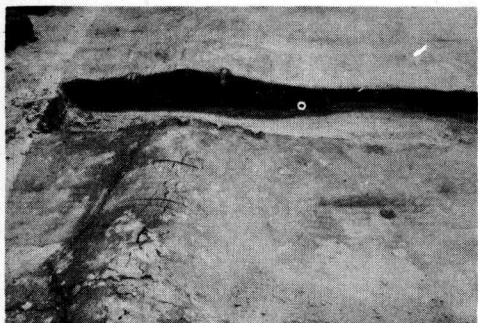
View Showing Pronounced Upheaval in Pavement Section 6B-1, Mix 7 Optimum Asphalt, 620 Coverages, 15,000-lb. Lane
